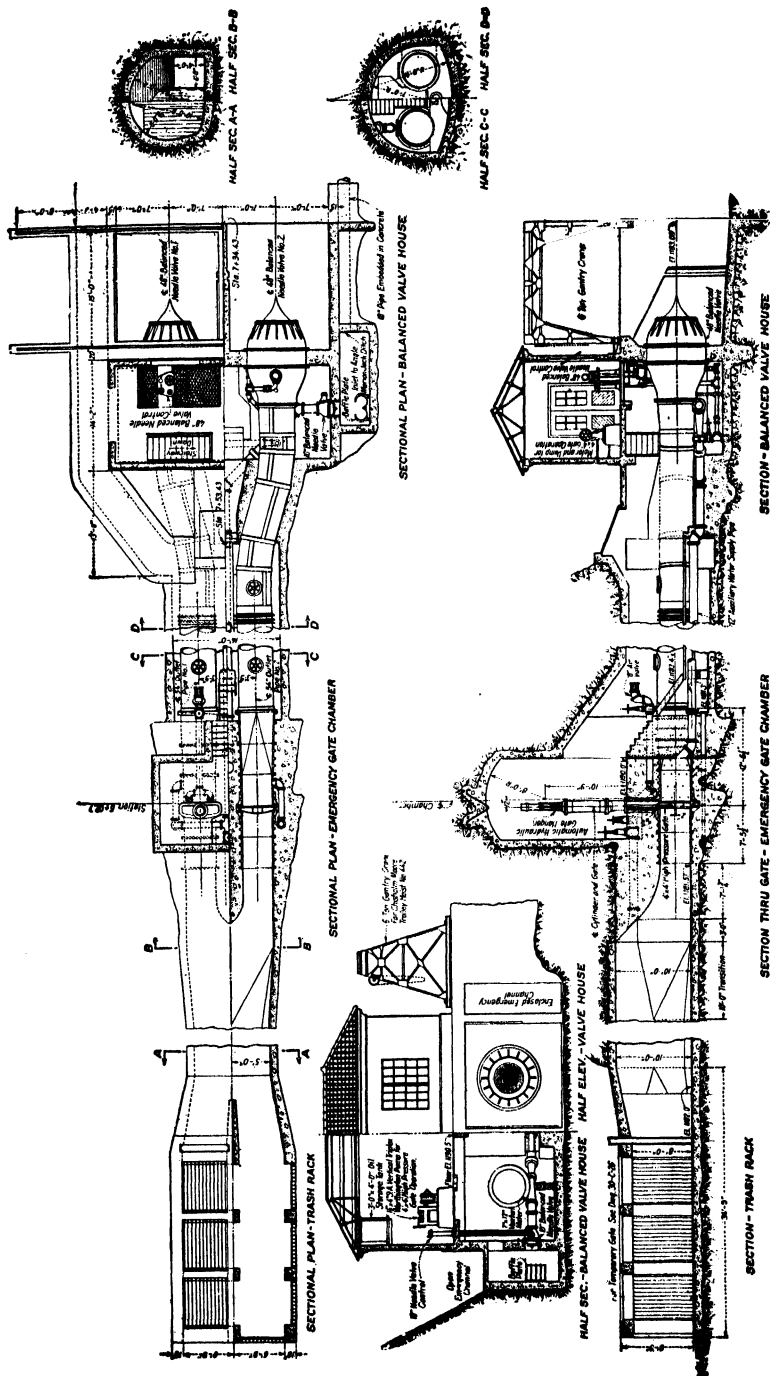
General arrangement of complete outlet works at McKay Dam. Typical diversion-tunnel type.
